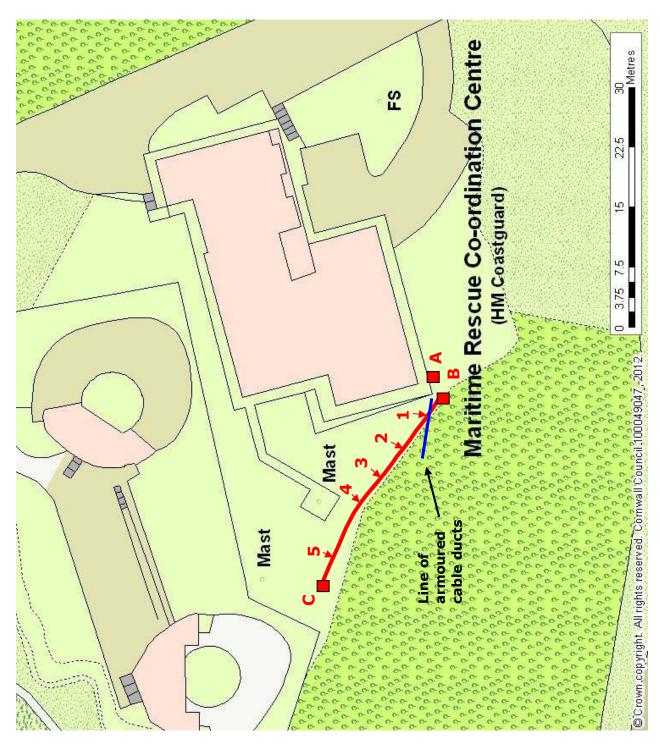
Plan showing location of Test pits, Water pipe trench, and position of Recorded sections
